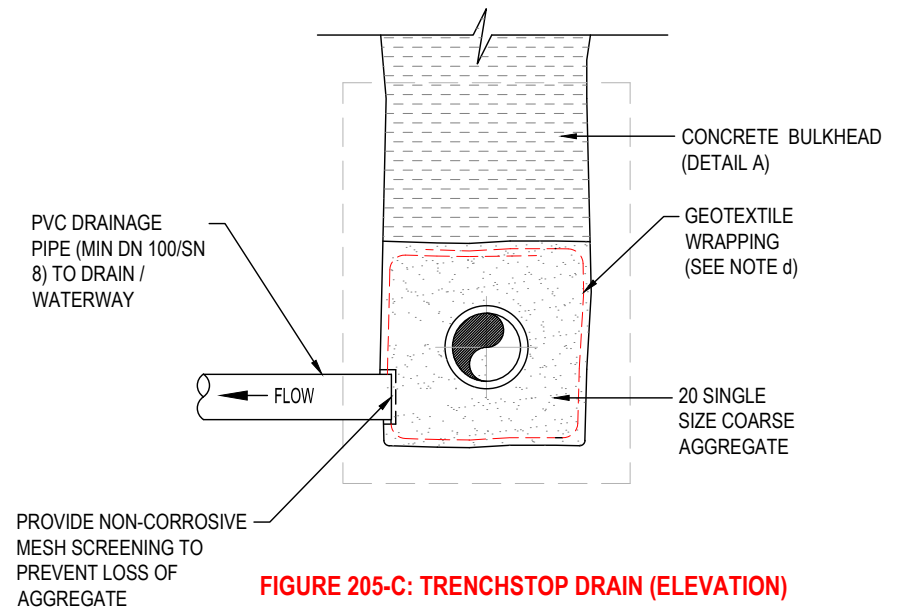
C: TRENCHSTOP DRAIN (ELEVATION)
